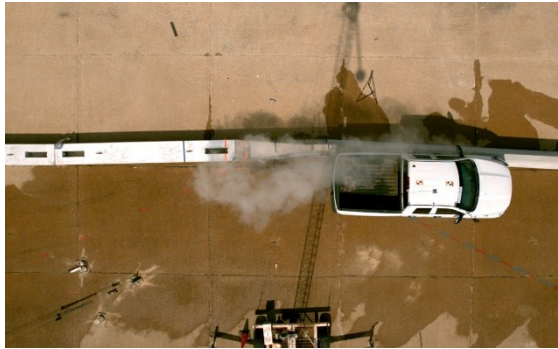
Sequential Photographs for Test No. 469469-4-2 (Overhead and Gut Views).
